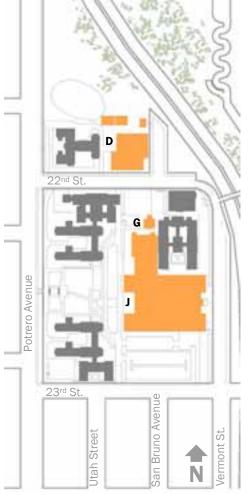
Potrero Campus Site Plan, 1971 - 1987
